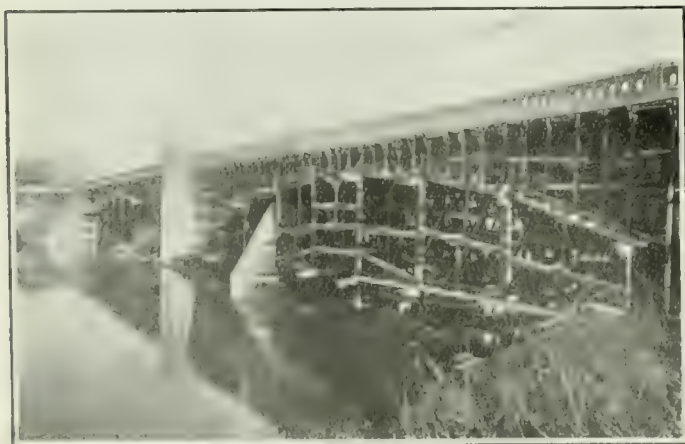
West half of bridge nearing completion. Falsework and supports under sidewalk forms still in place. Handrail placed, and workmen engaged cleaning and scrubbing same.
